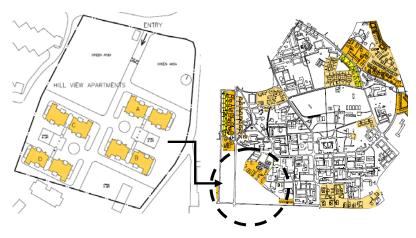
Site plan of hill view apartments in IIT campus, Roorkee.
